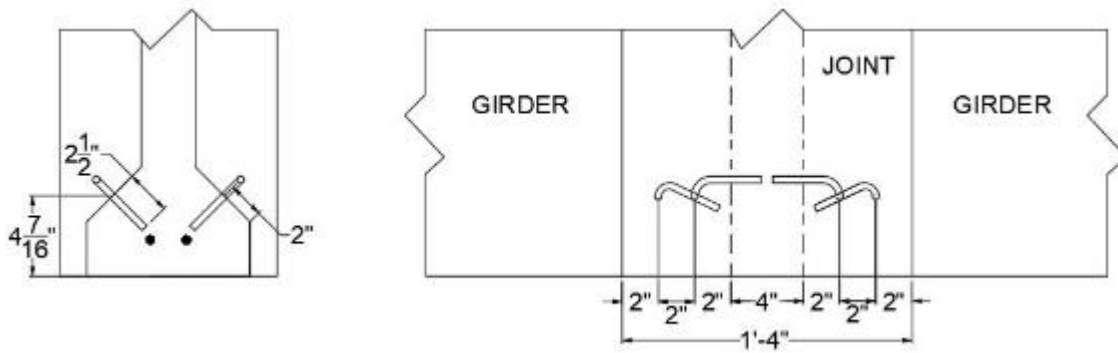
Retrofit continuity joint rebar shear studs detail for positive moment
